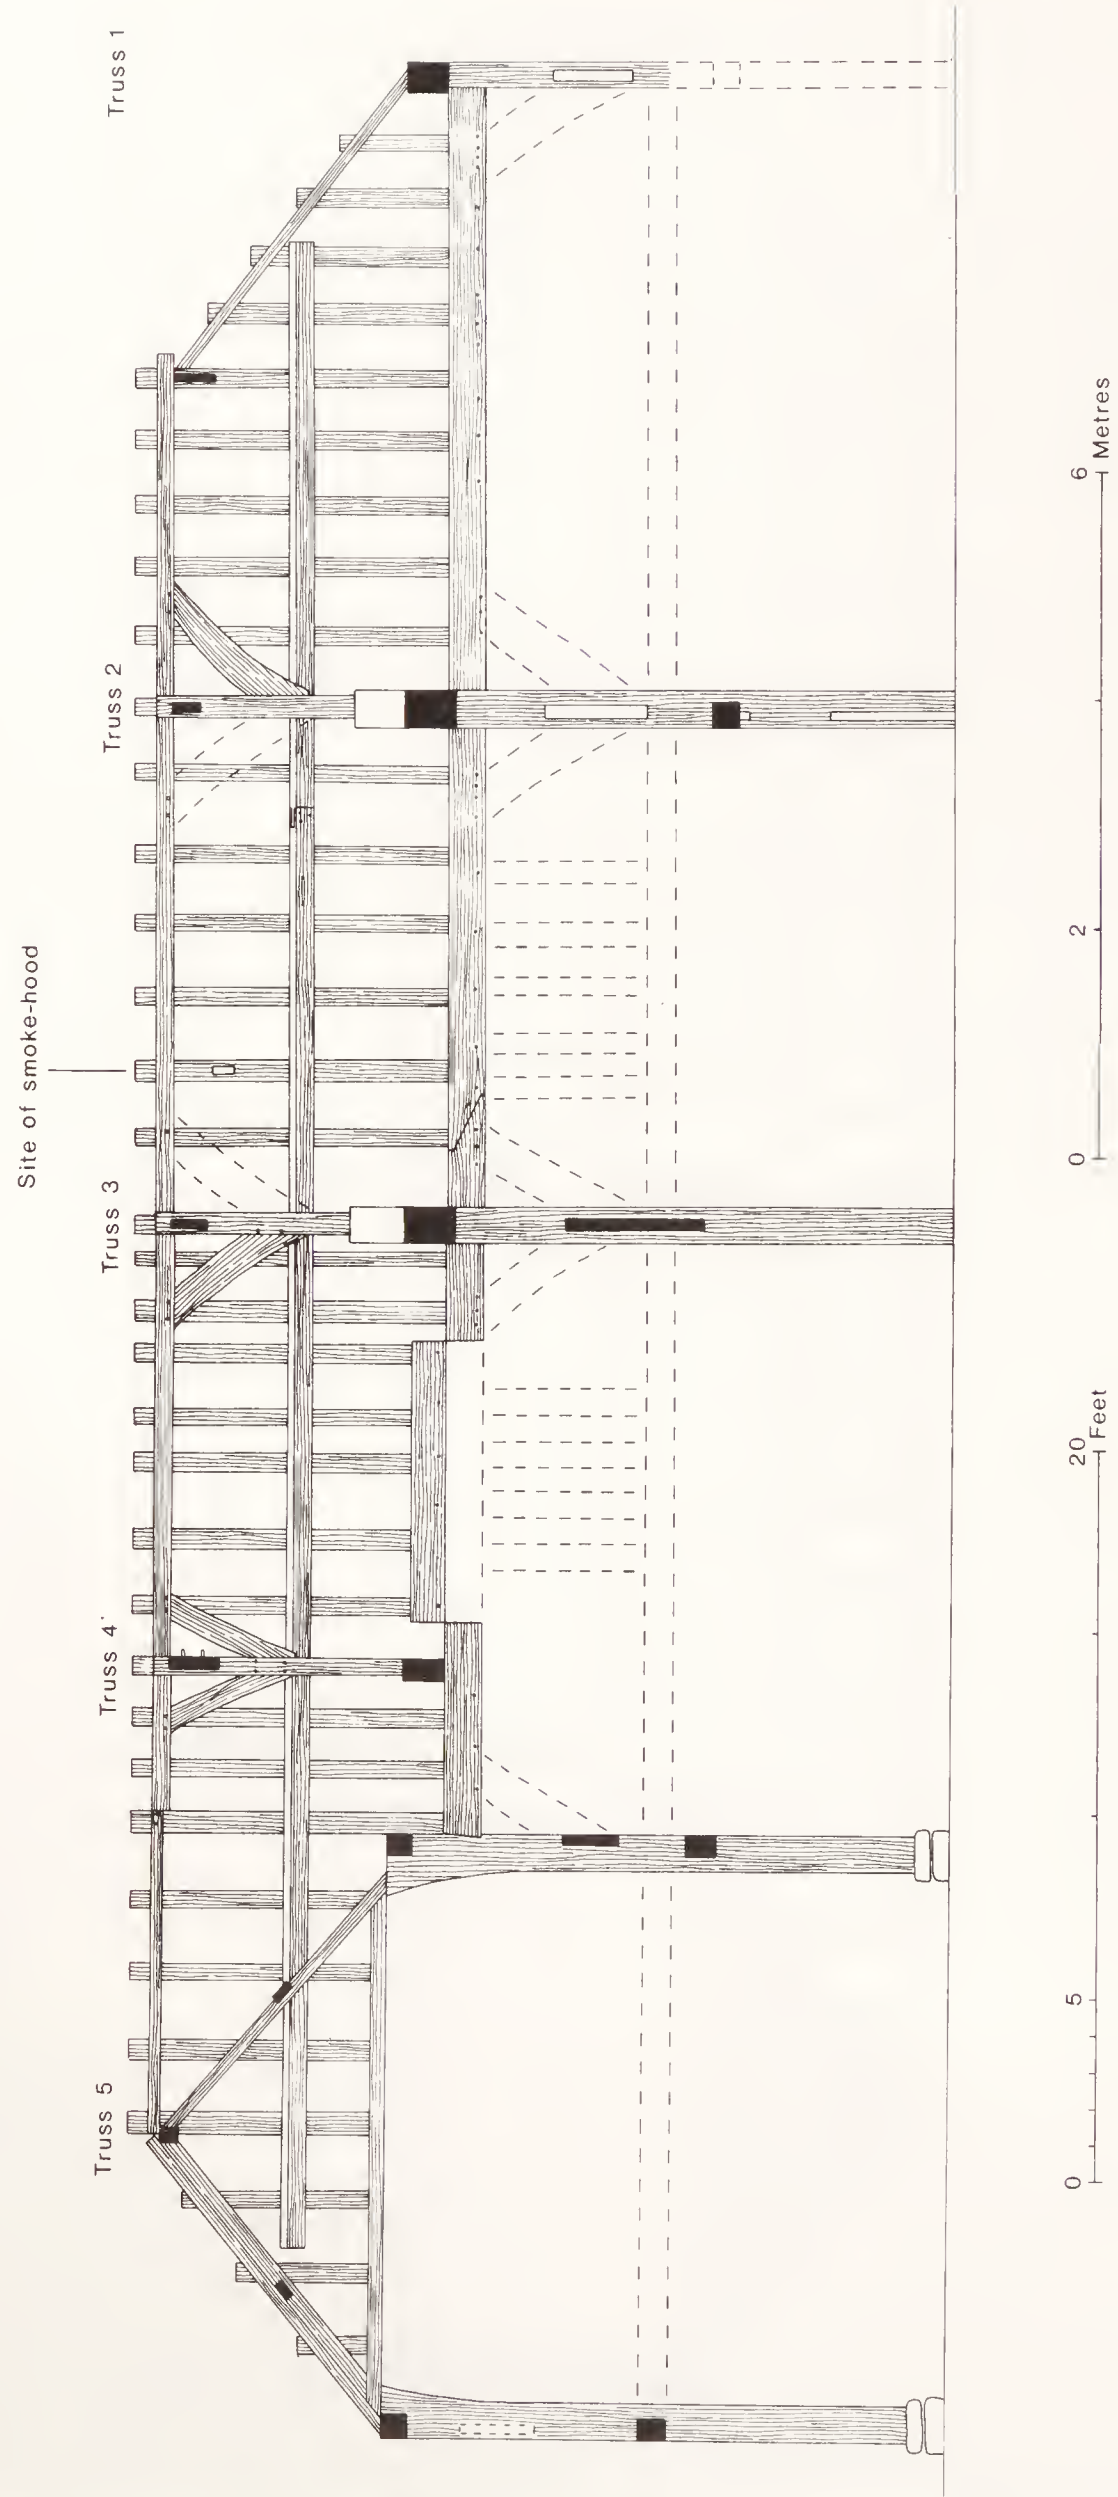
Elevation through hall, service bay and east wing, south-west side.
